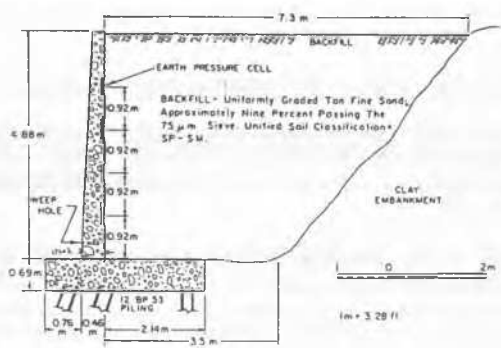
Cantlever Retaining Wall Set up (Coyle et al)
